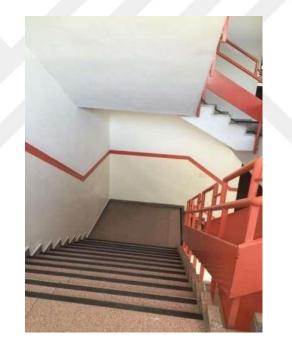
Stairs connecting the ground and first floor (Location in Figure 4.1)
